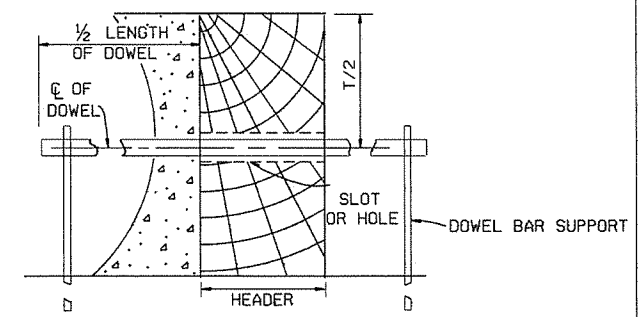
DETAIL OF JOINT SUPPORT FOR EXPANSION JOINTS
